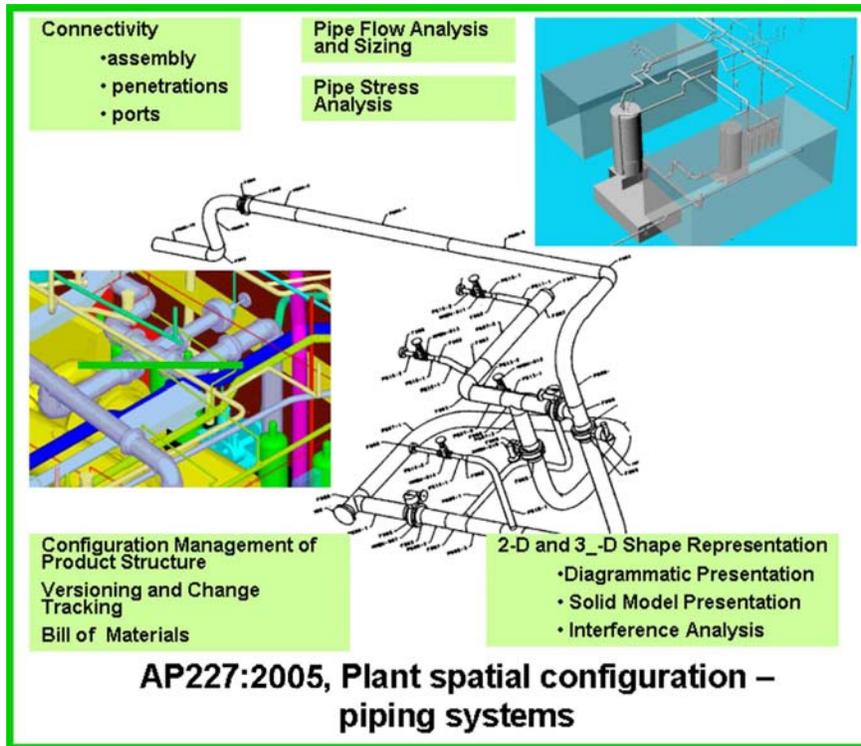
ISO 10303-227 Plant spatial configuration – Piping
